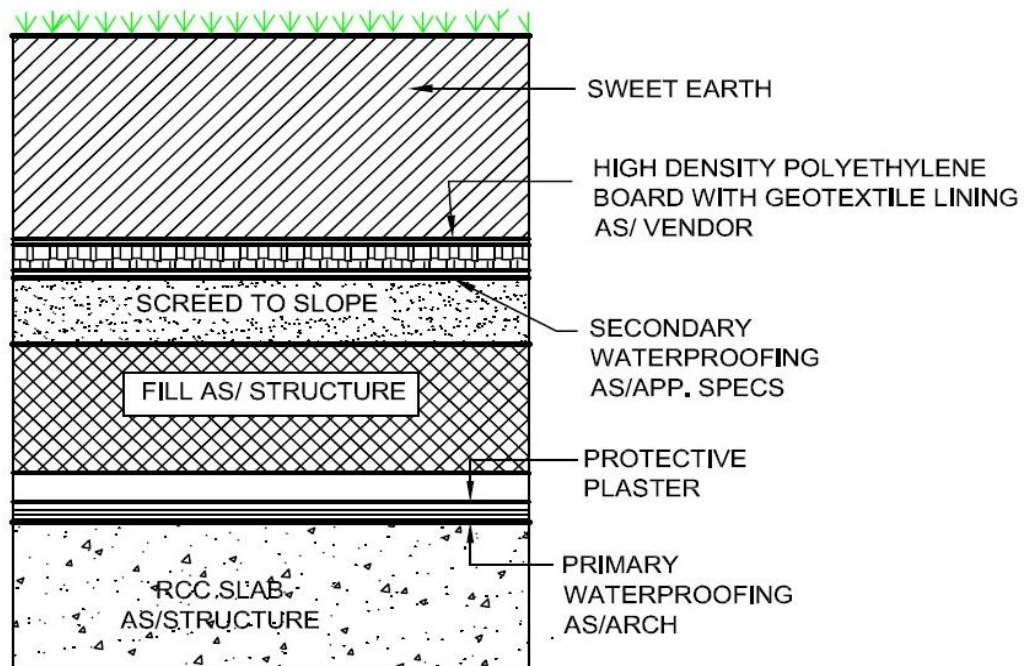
TYPICAL PODIUM LANDSCAPE LAYOUT
